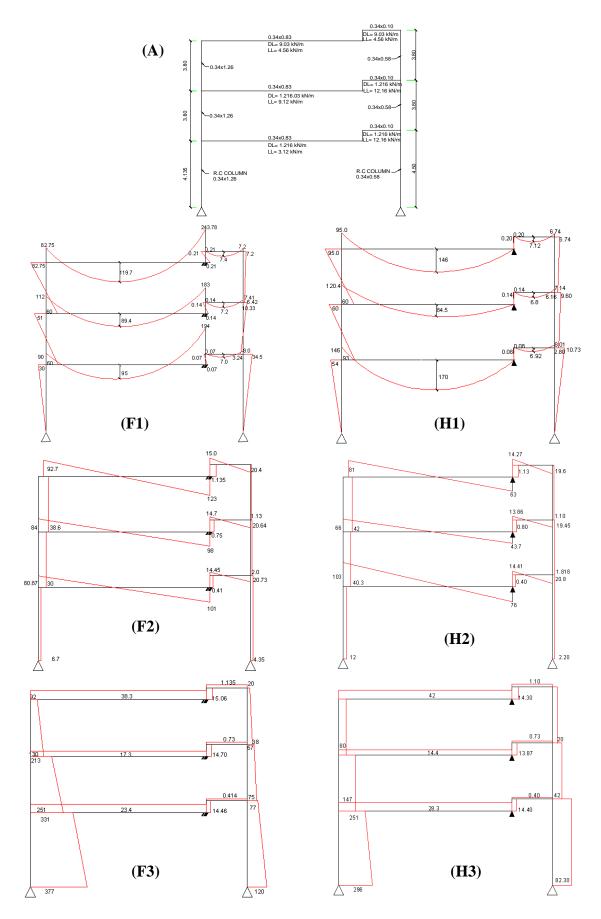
(A) Loading diagram, (F1-H1) Moments under gravity, (F2-H2) Shear forces under gravity load, (F3-H3) Axial forces under gravity load (Note: F-fixed, H-hinged)
